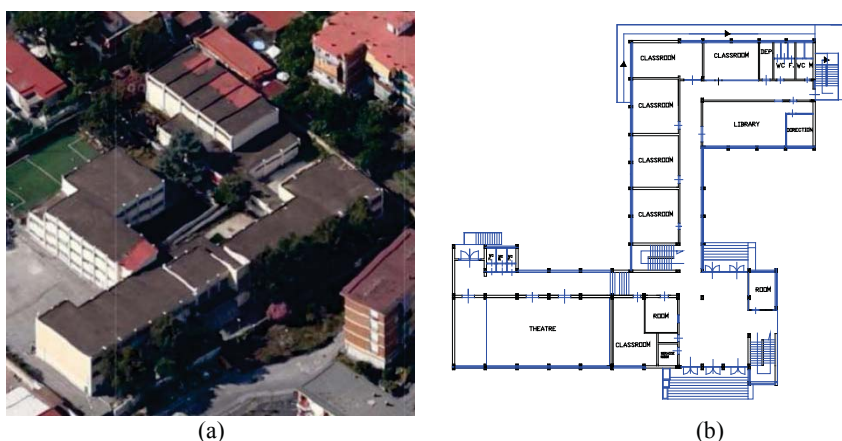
A bird's-eye-view of the school complex (a) and the ground floor layout of the examined building (b).
